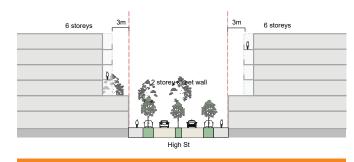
High Street, High Street Precinct. A two-storey street wall height is proposed, consistent with the existing character.
